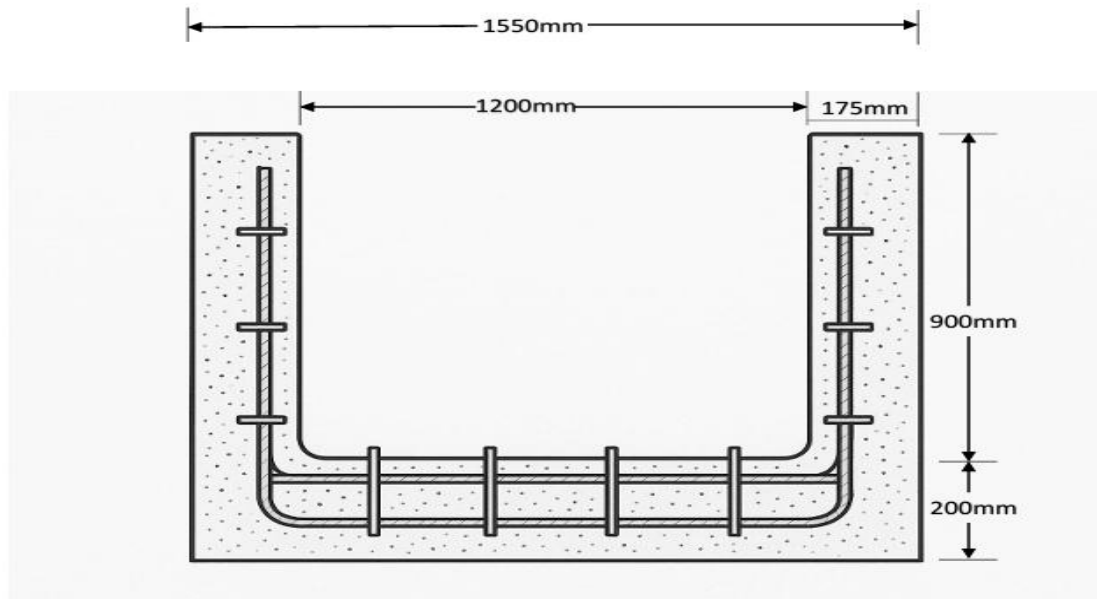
Cross-sectional view of recommended drainage design for Nnebisi, DLA and Summit roads
